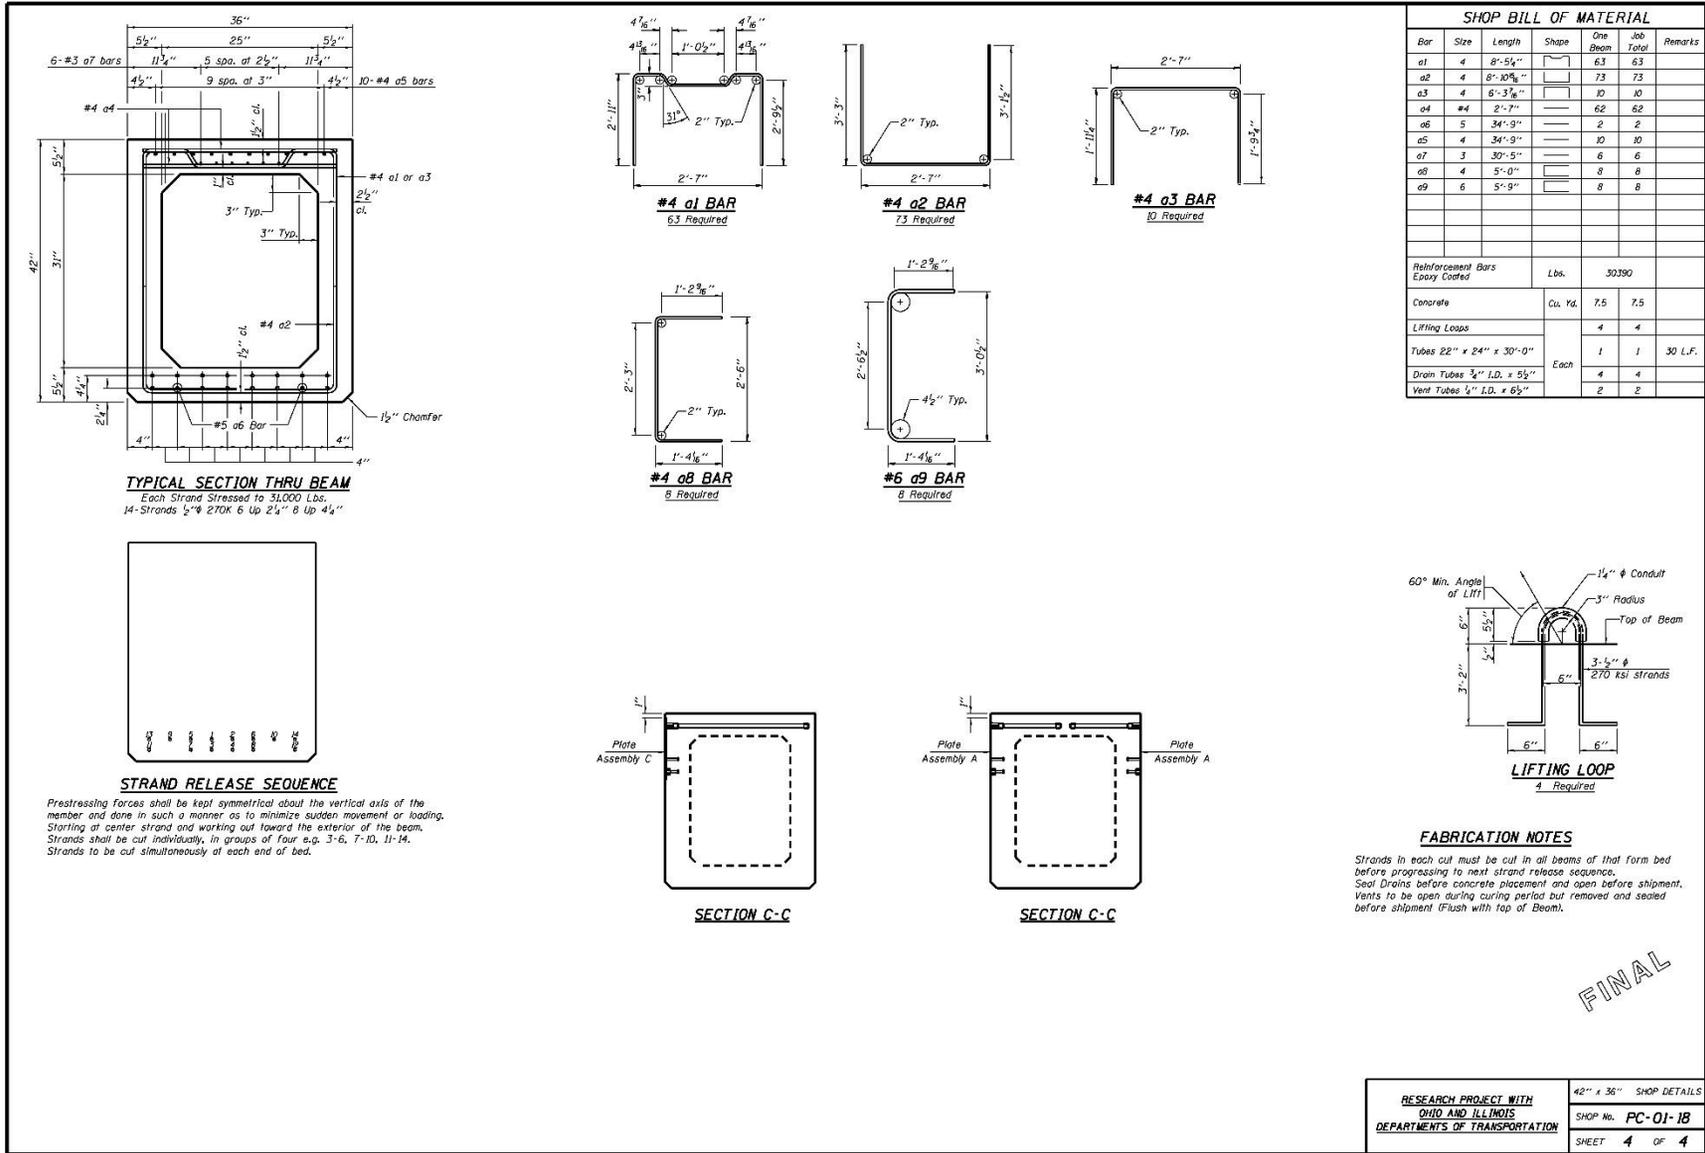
Illini Concrete Box-Beam Girder Details, Sheet 4 of 4
